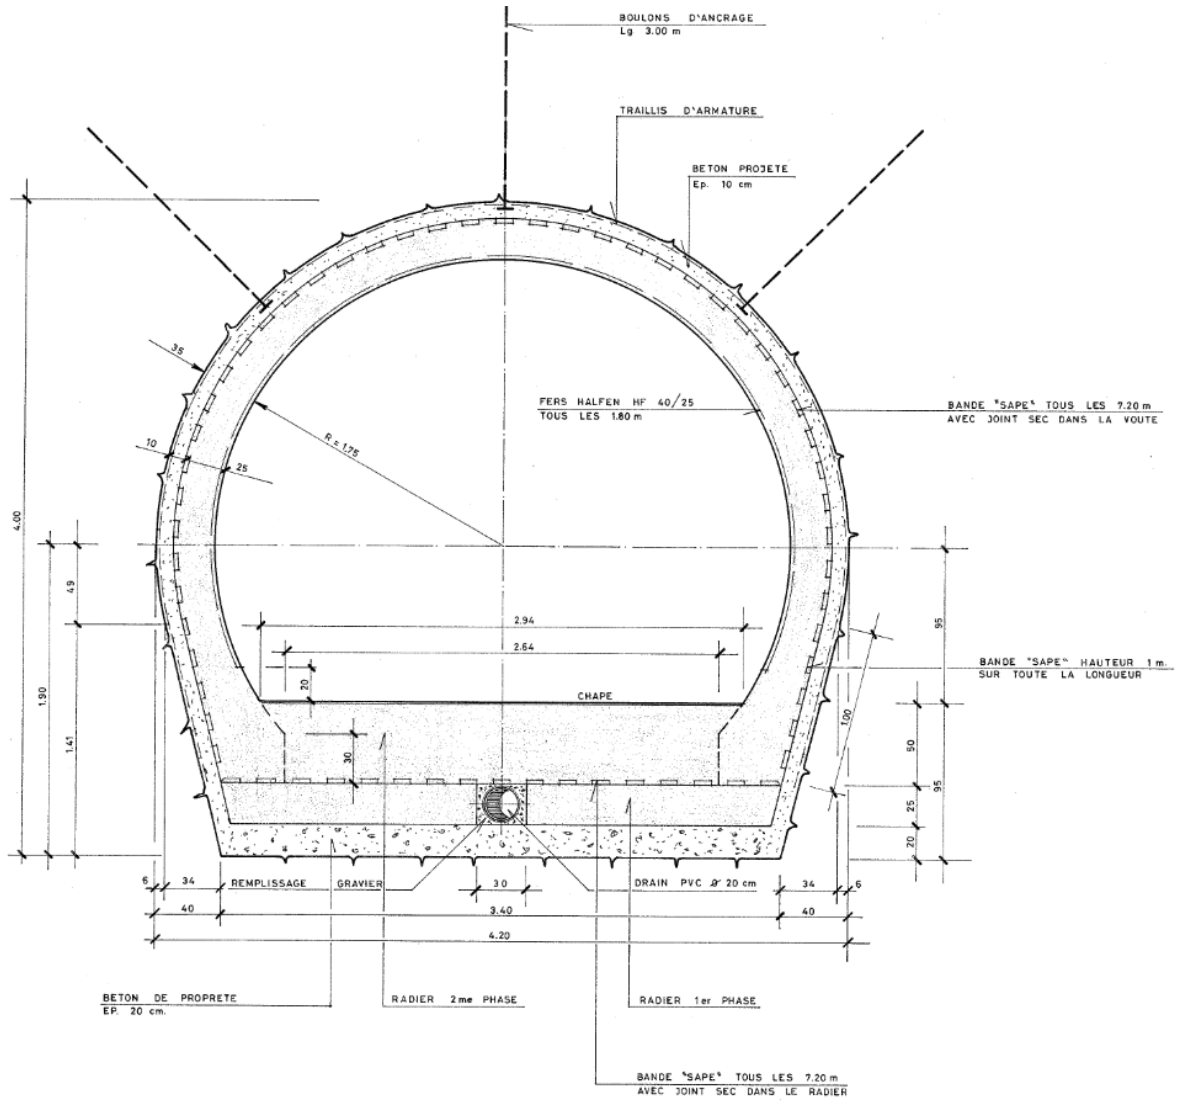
As-built typical section of tunnel TI12 showing form of construction.
